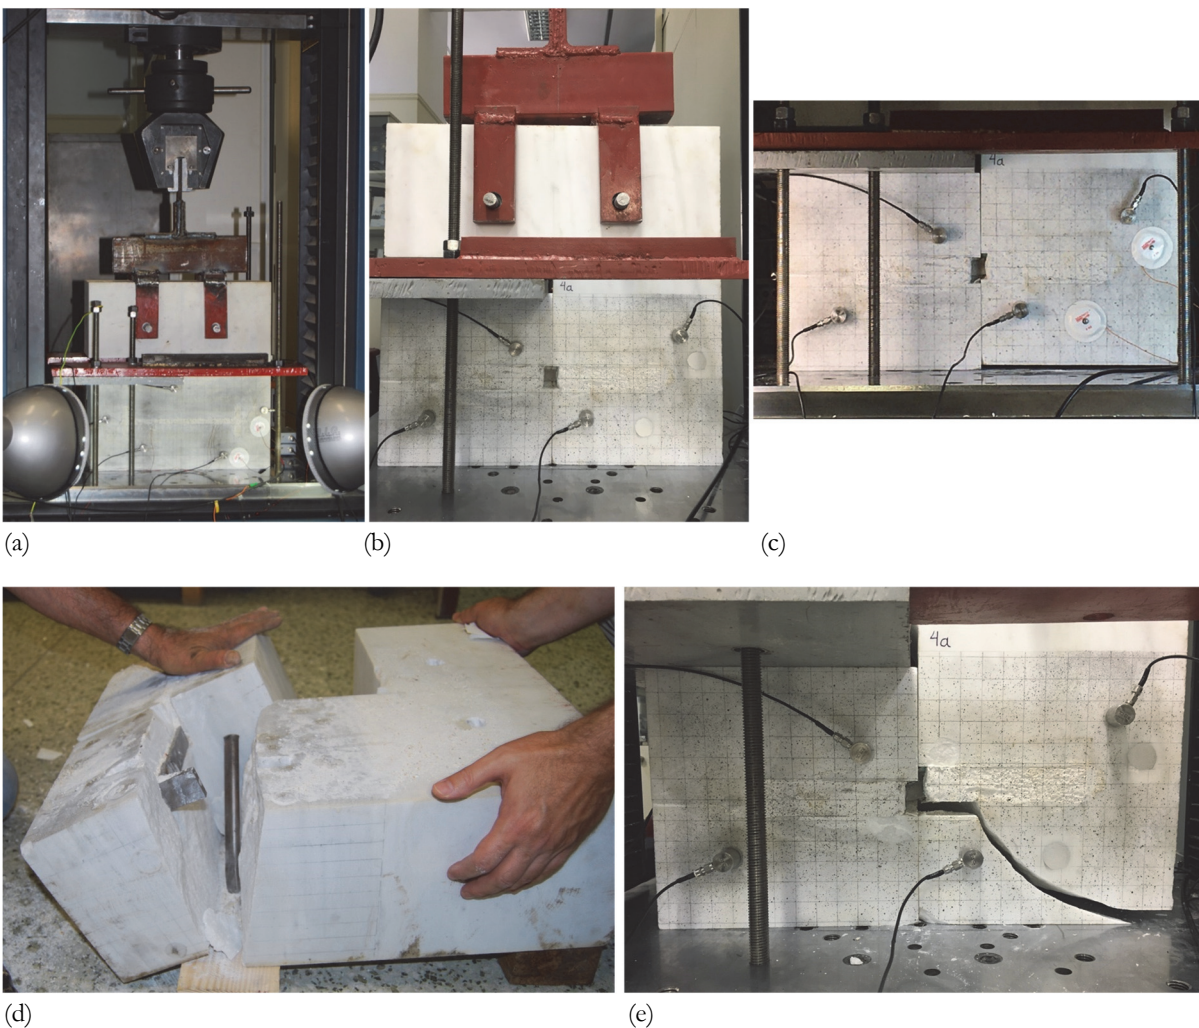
(a) Typical specimen with “I”-shaped connector while loaded (a); Detailed view of a specimen with “II”-shaped connector at the onset of loading (b) and just before fracture (c); Fractured specimens with “I”- (d) and “II”-shaped connectors (e).
